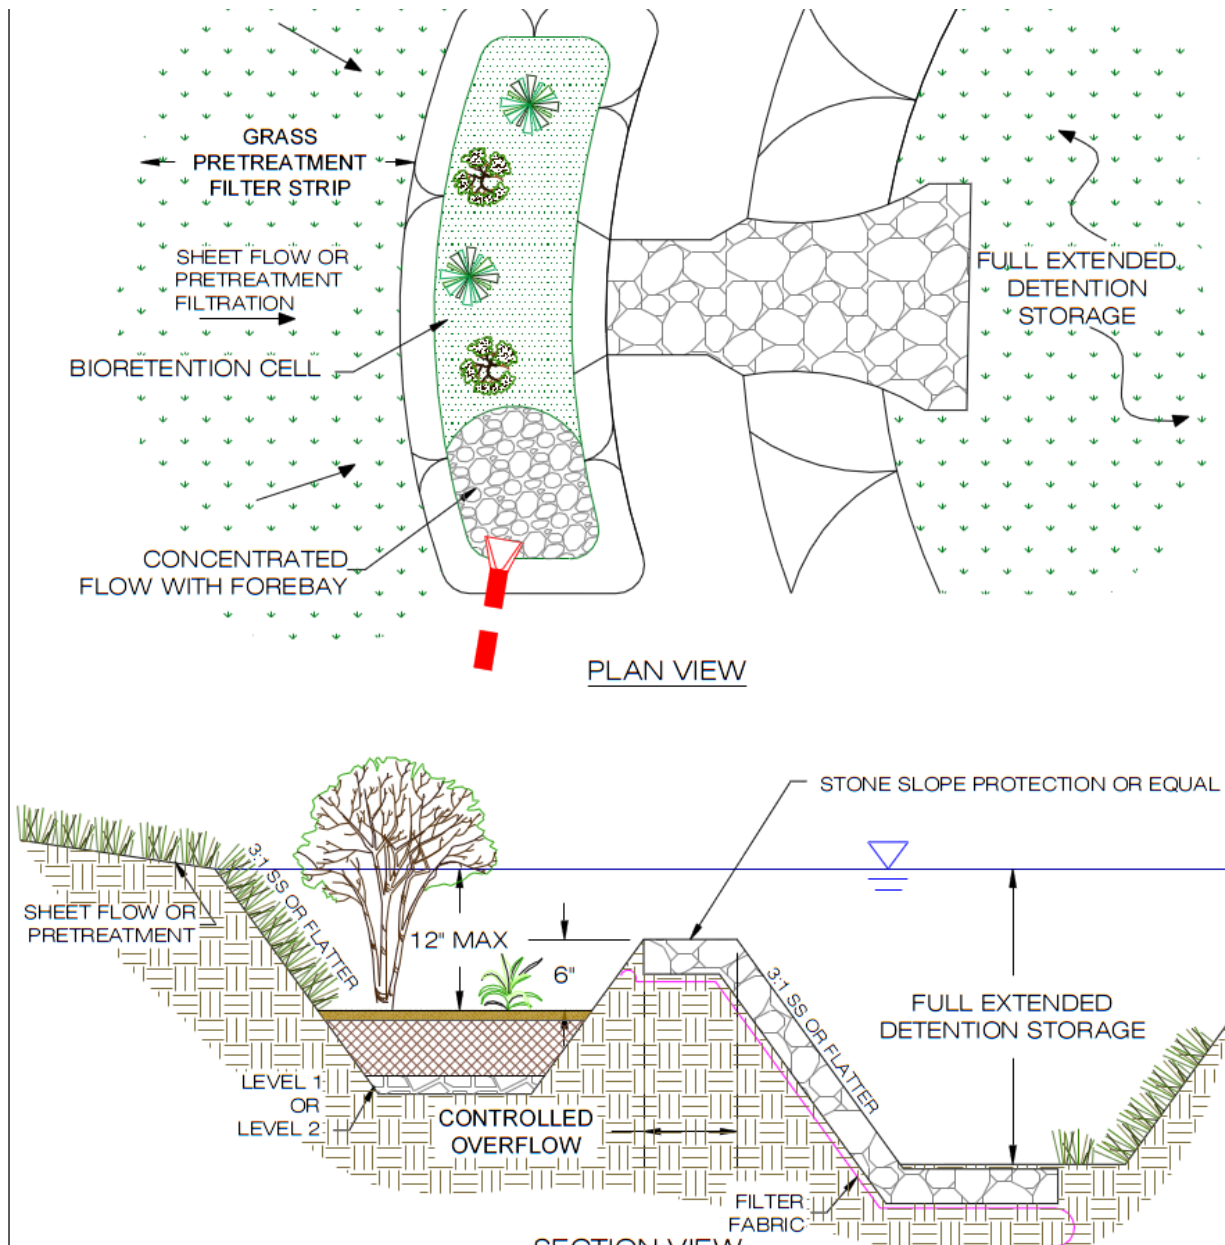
Typical Detail of a Bioretention Basin within the Upper Shelf of an ED Pond
